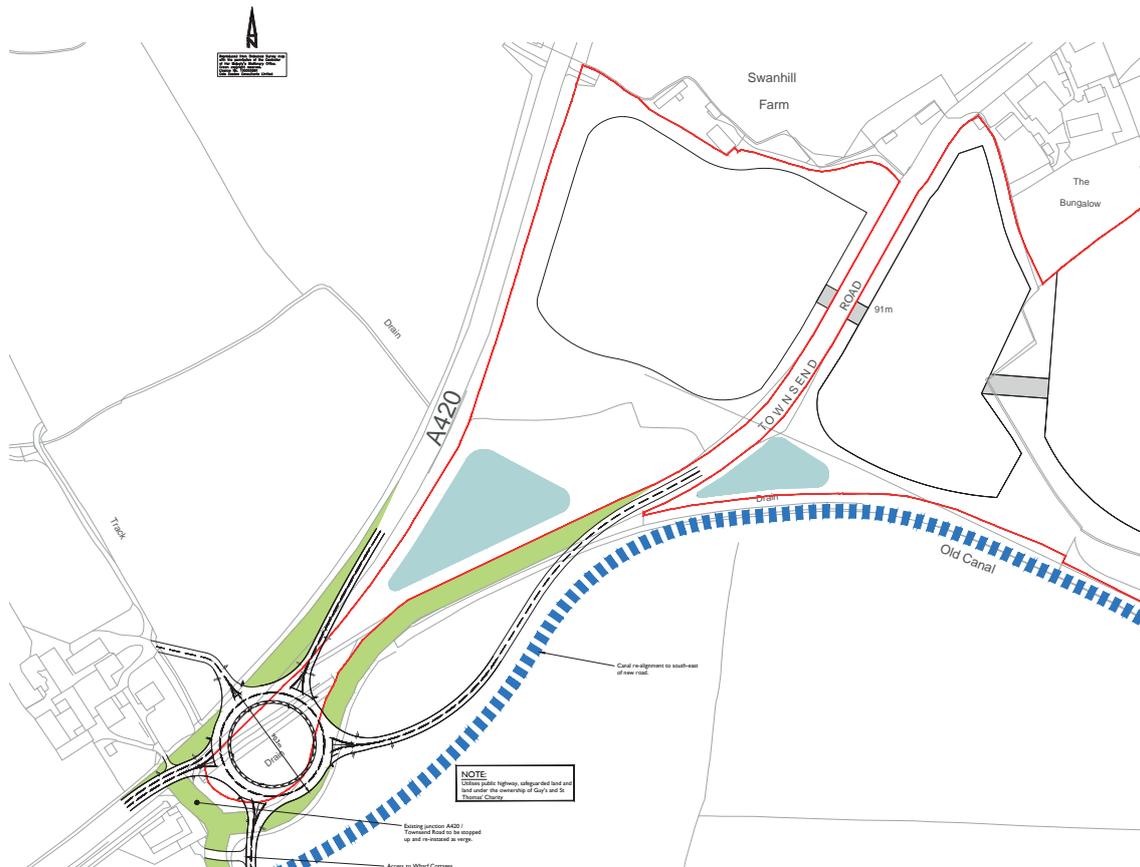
PROPOSED UPGRADED ACCESS ARRANGEMENT ONTO TOWNSEND ROAD - OPTION 1
